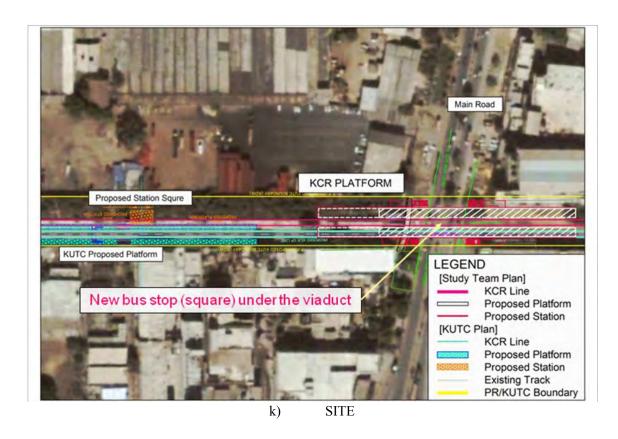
Provisional Station Plaza Plan (7/15)
